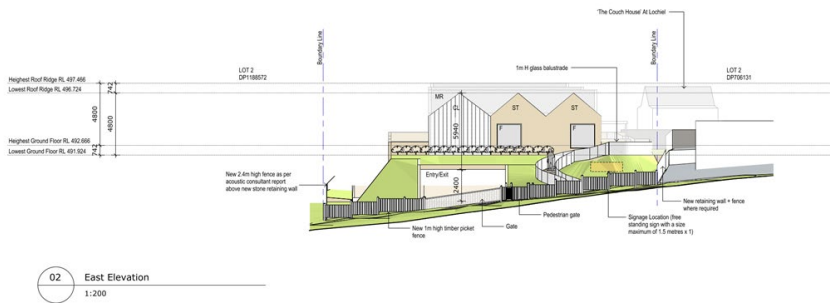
East Elevation demonstrating consistent scale with 'Lochiel house'.
